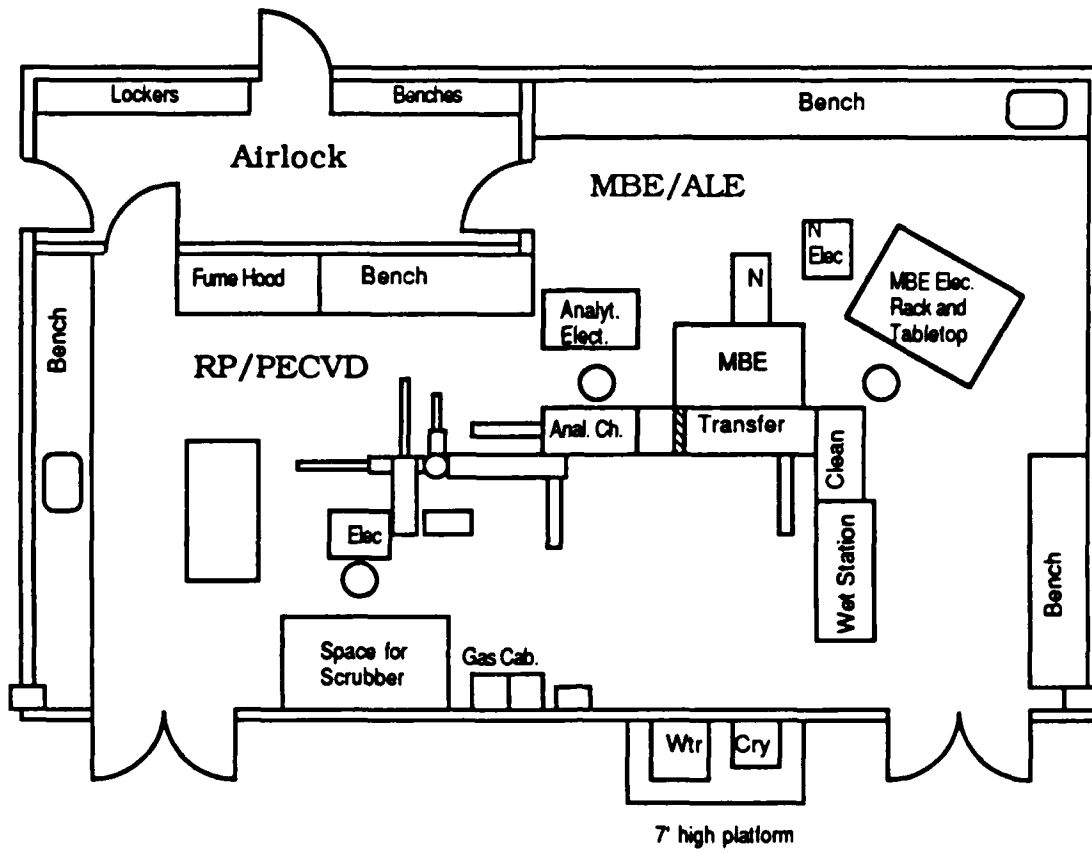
Floor plan of new laboratory in NCSU Research Facility currently under construction. Diamond CVD apparatus, analytical system and GaN MBE Unit are also shown.
